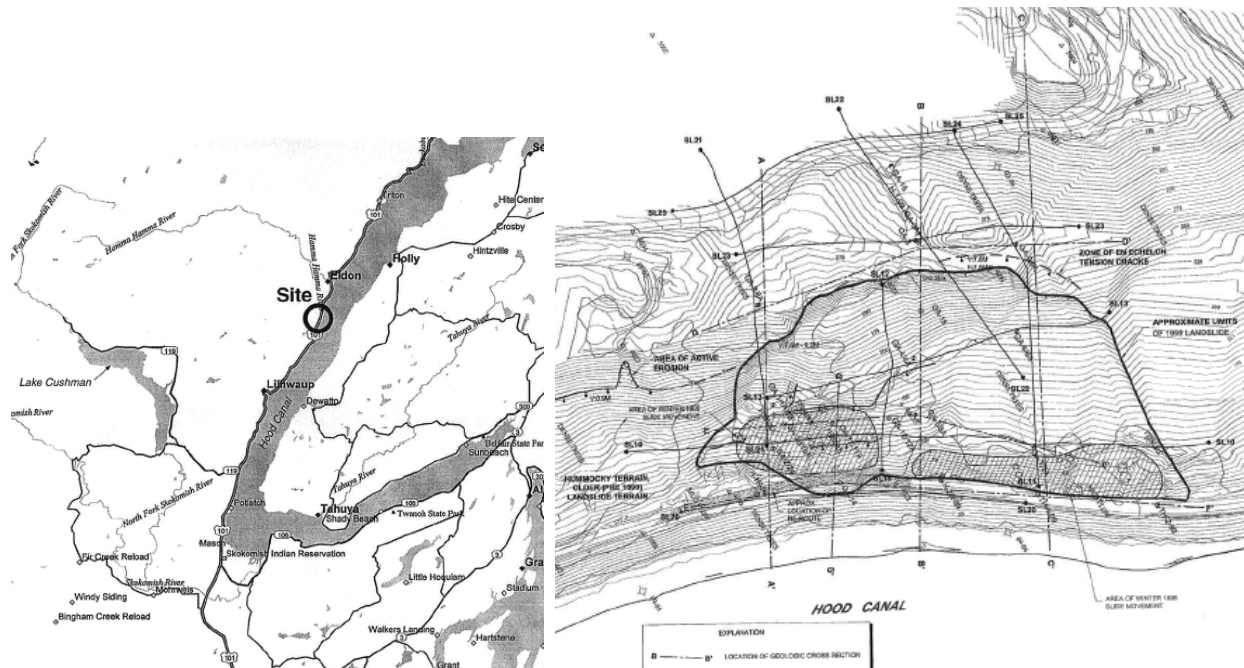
SR 101 MP 322, Site Plans (Golder, 2000)
